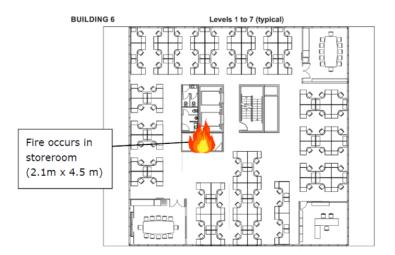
Location of design fire in the UT1 scenario. The fire occurs in a storage room.
